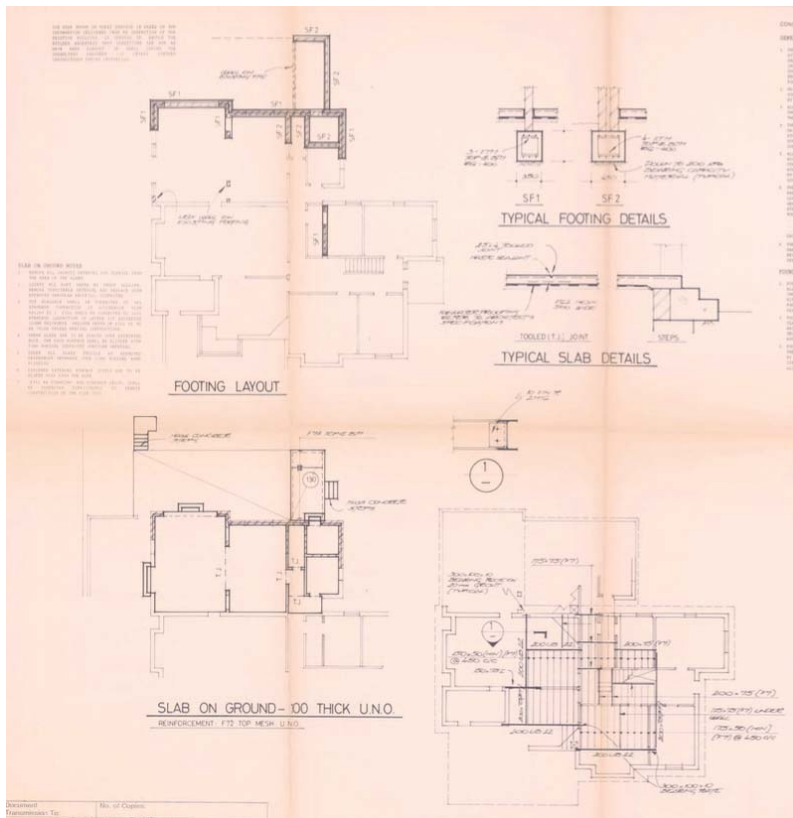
, Structural drawings by Tihanyi Consulting Engineers, executed in 1998 for the owners, Frances and Sean Foster. Note the concrete slab on ground.
